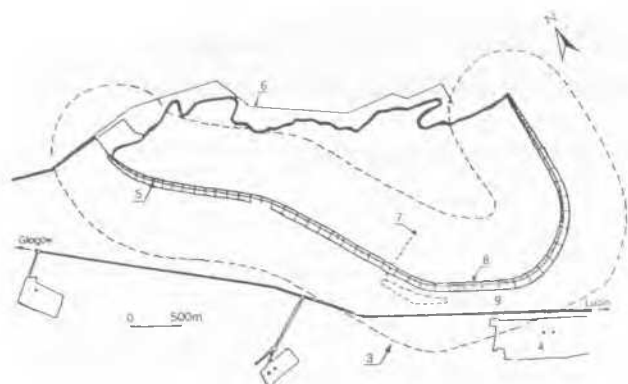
General layout of abandoned tailings pond Gilow. 1,2,4-Shafts, 3-Border line of protection embankment, 5-Tailings transportation pipeline along embankments, 6-Tailings transportation pipeline along axis of the pond. 7,8-Decant towers. 9-Decant water pipeline.
